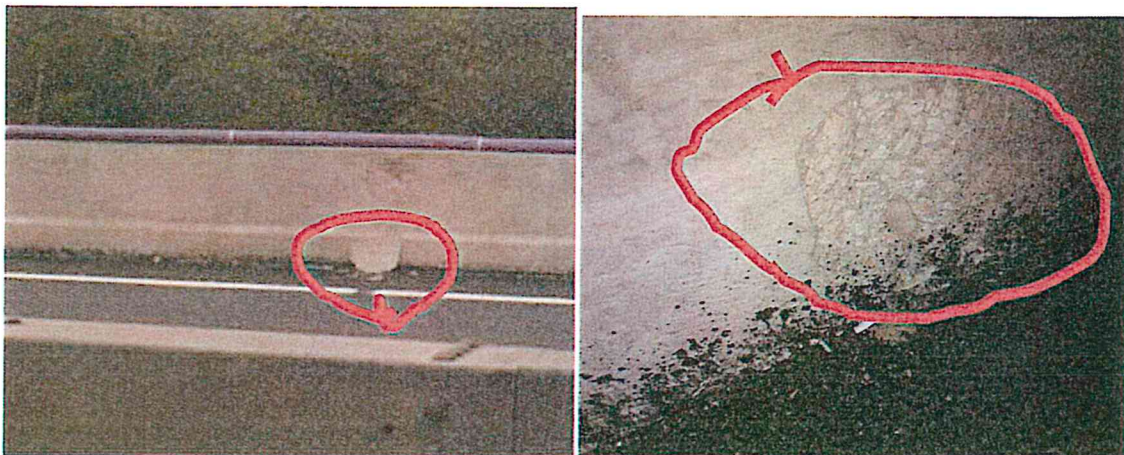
Photographs of spalled concrete area or surface 'pop-outs'
